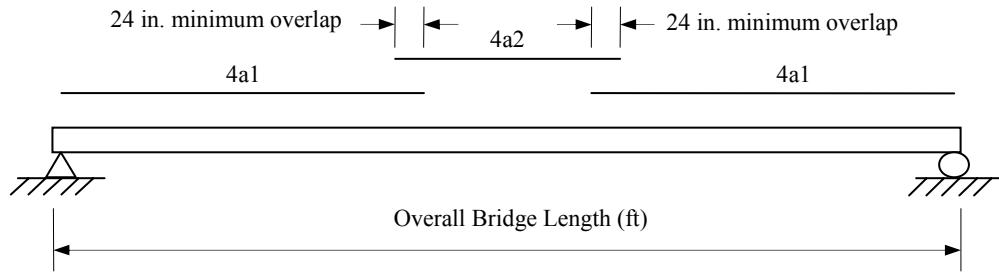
Typical longitudinal layout of T & S reinforcement.
